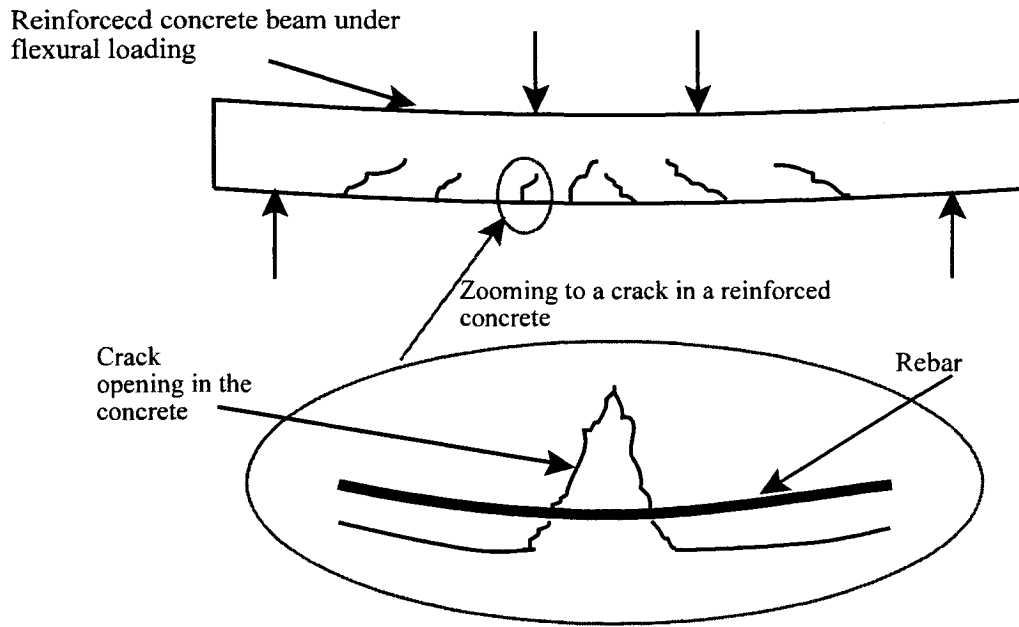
Cracks in a reinforced concrete beam under flexural loading.
